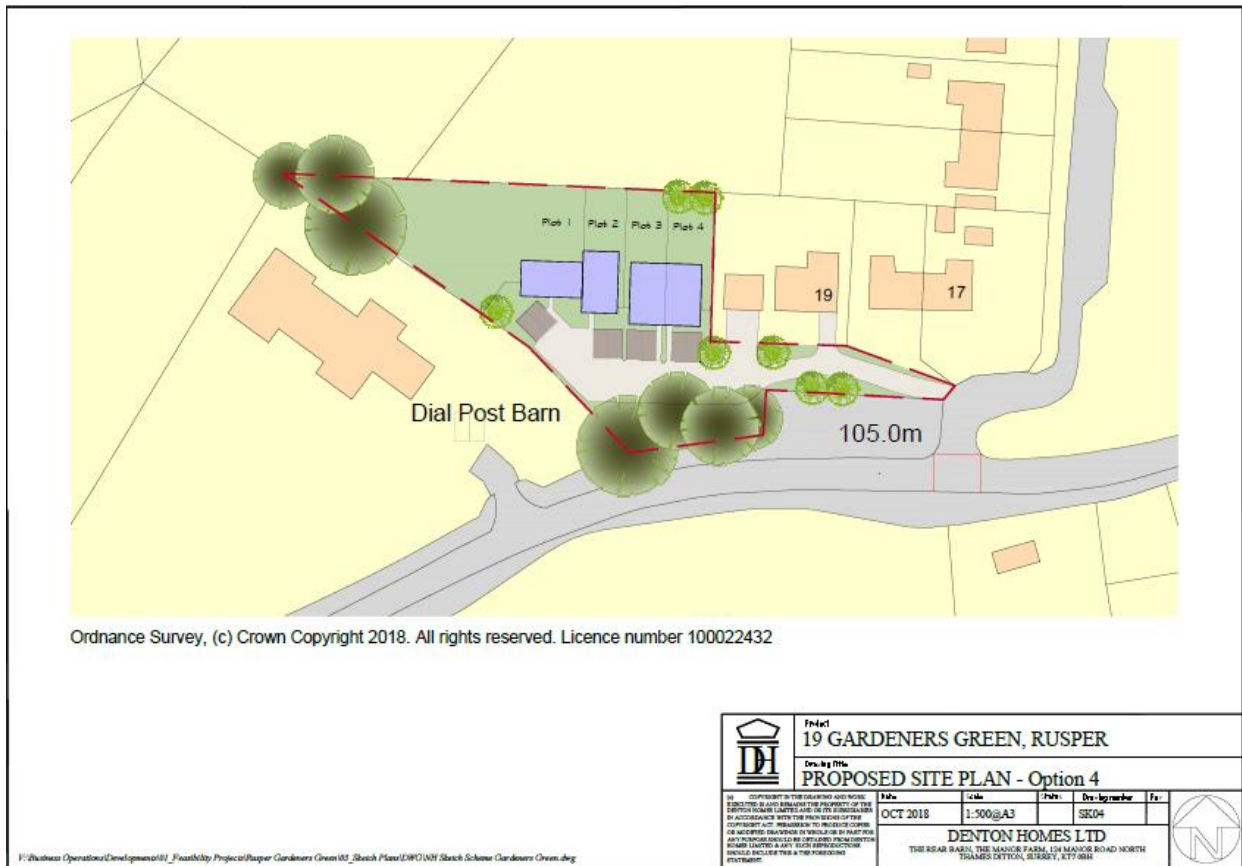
Site plan showing indicative layout for housing at Land At 19 Gardeners Green.
